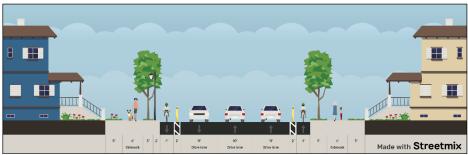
Complete Streets Retrofitting on Washington Avenue.
